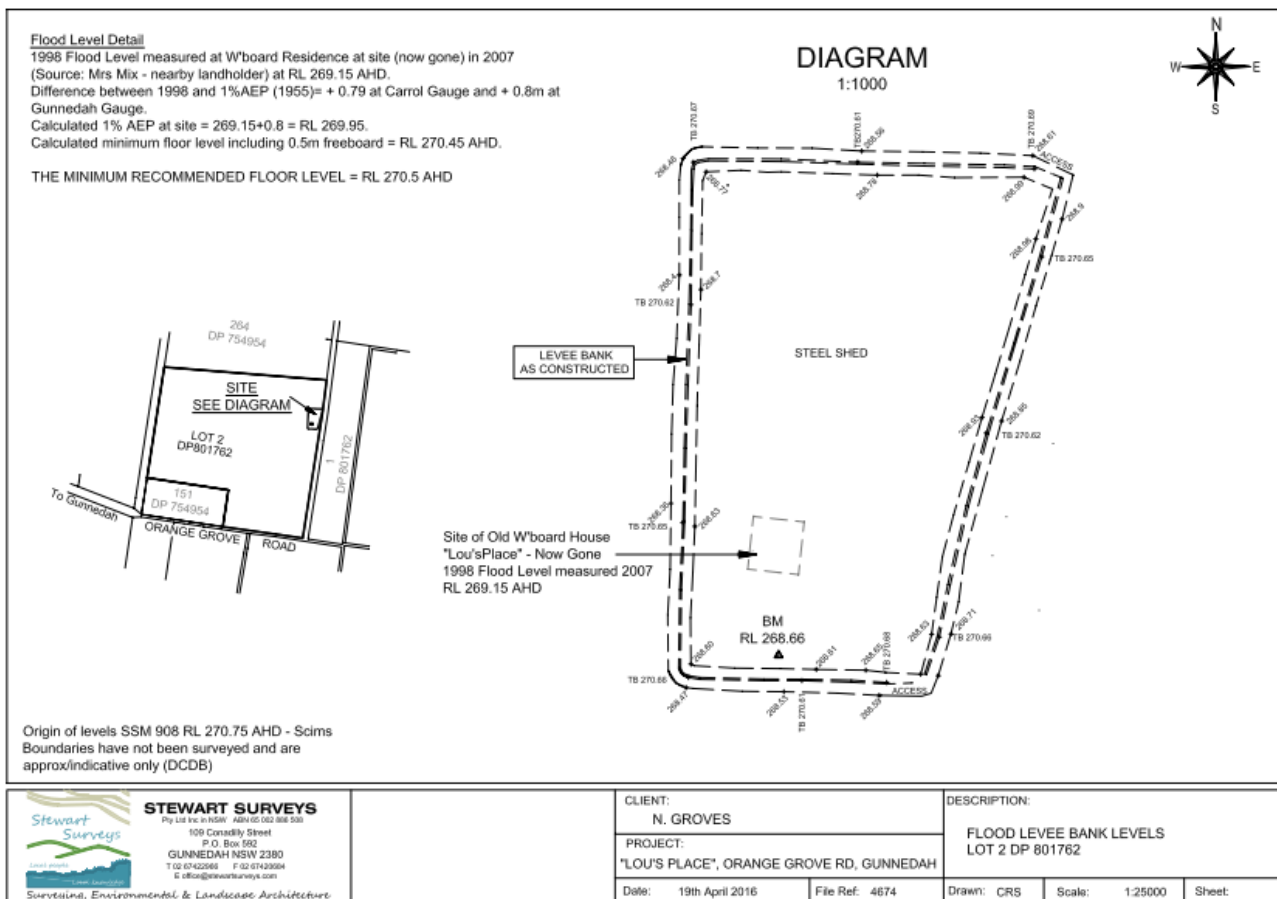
Construction details for ring levee at 765 Orange Grove Road (Myalla, or “Lou’s Place”)
